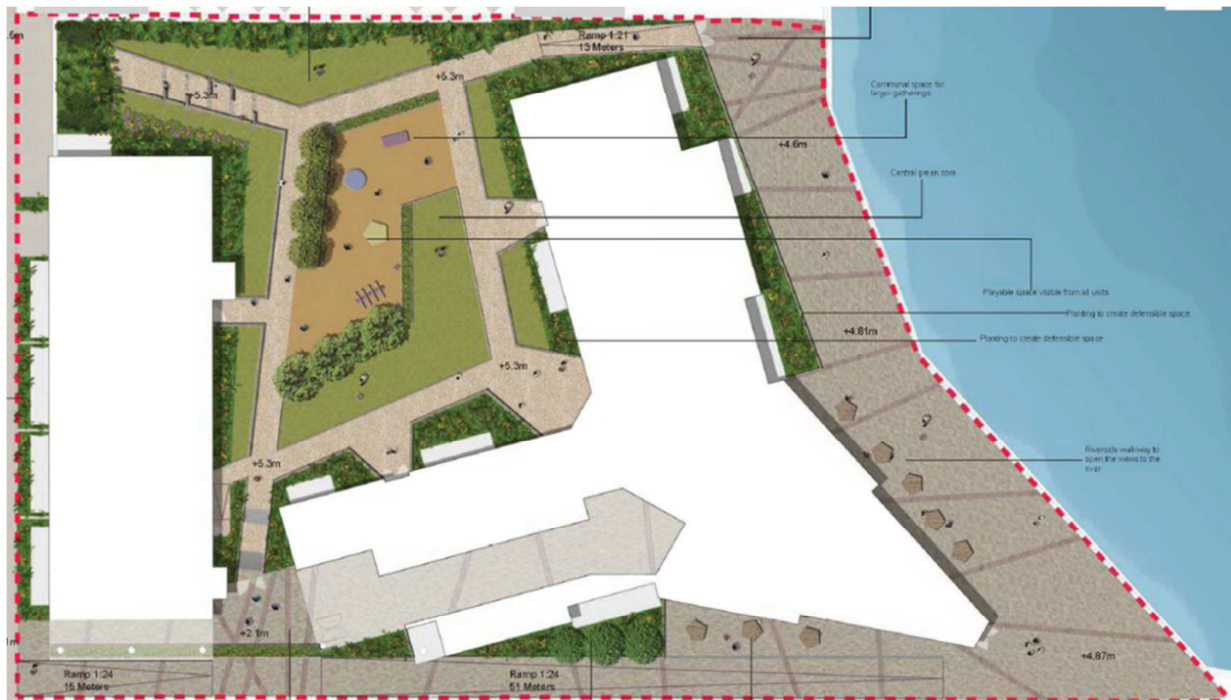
General Site Layout - with rectangular Block B to the left and the larger two winged Block A. Blocks linked at lower ground floor by the car park and refuse storage area located beneath the central podium (upper ground floor level) landscaped courtyard. River Walkway and public link path from Leven Road shown on right and bottom edge of layout plan
